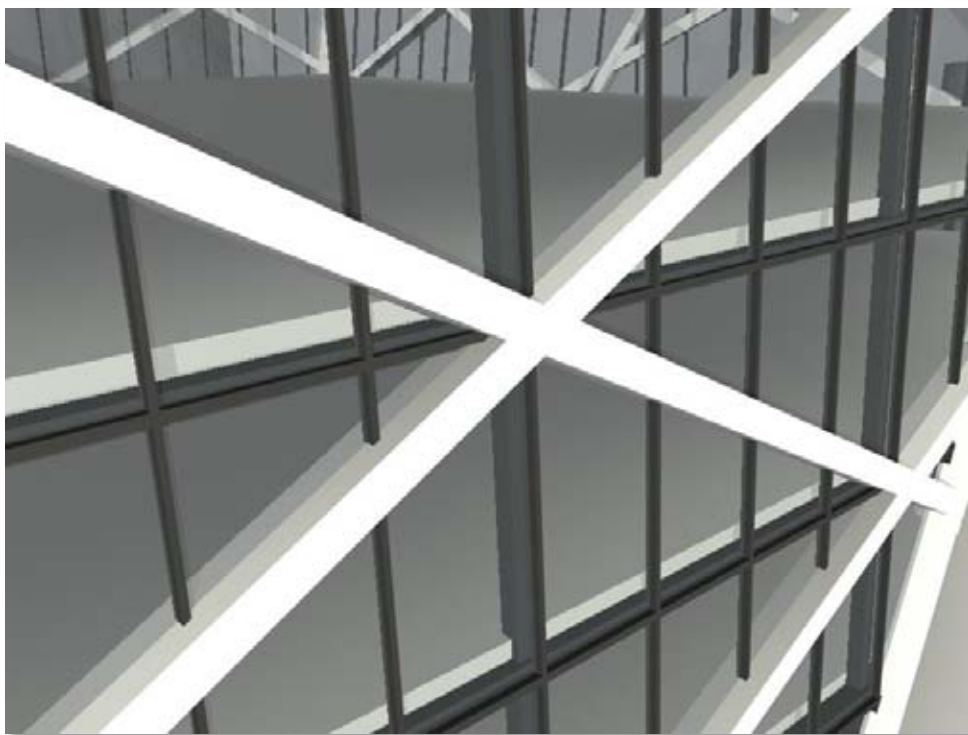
FAÇADE BRIGHT AND DARK STRUCTURE
